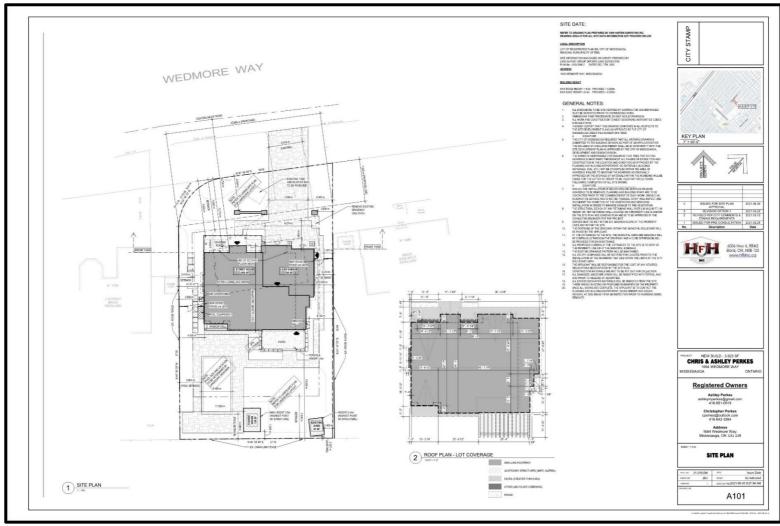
Proposed Development – Site Plan (H4H Inc. 2021)
